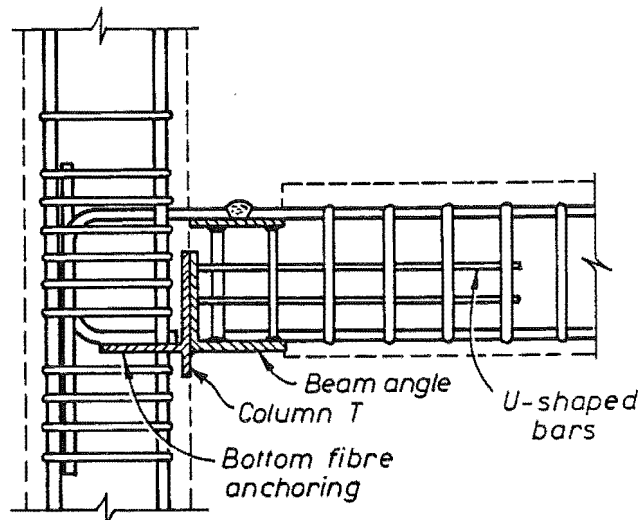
Connection Detail Tested by Bhatt and Kirk (1985).
